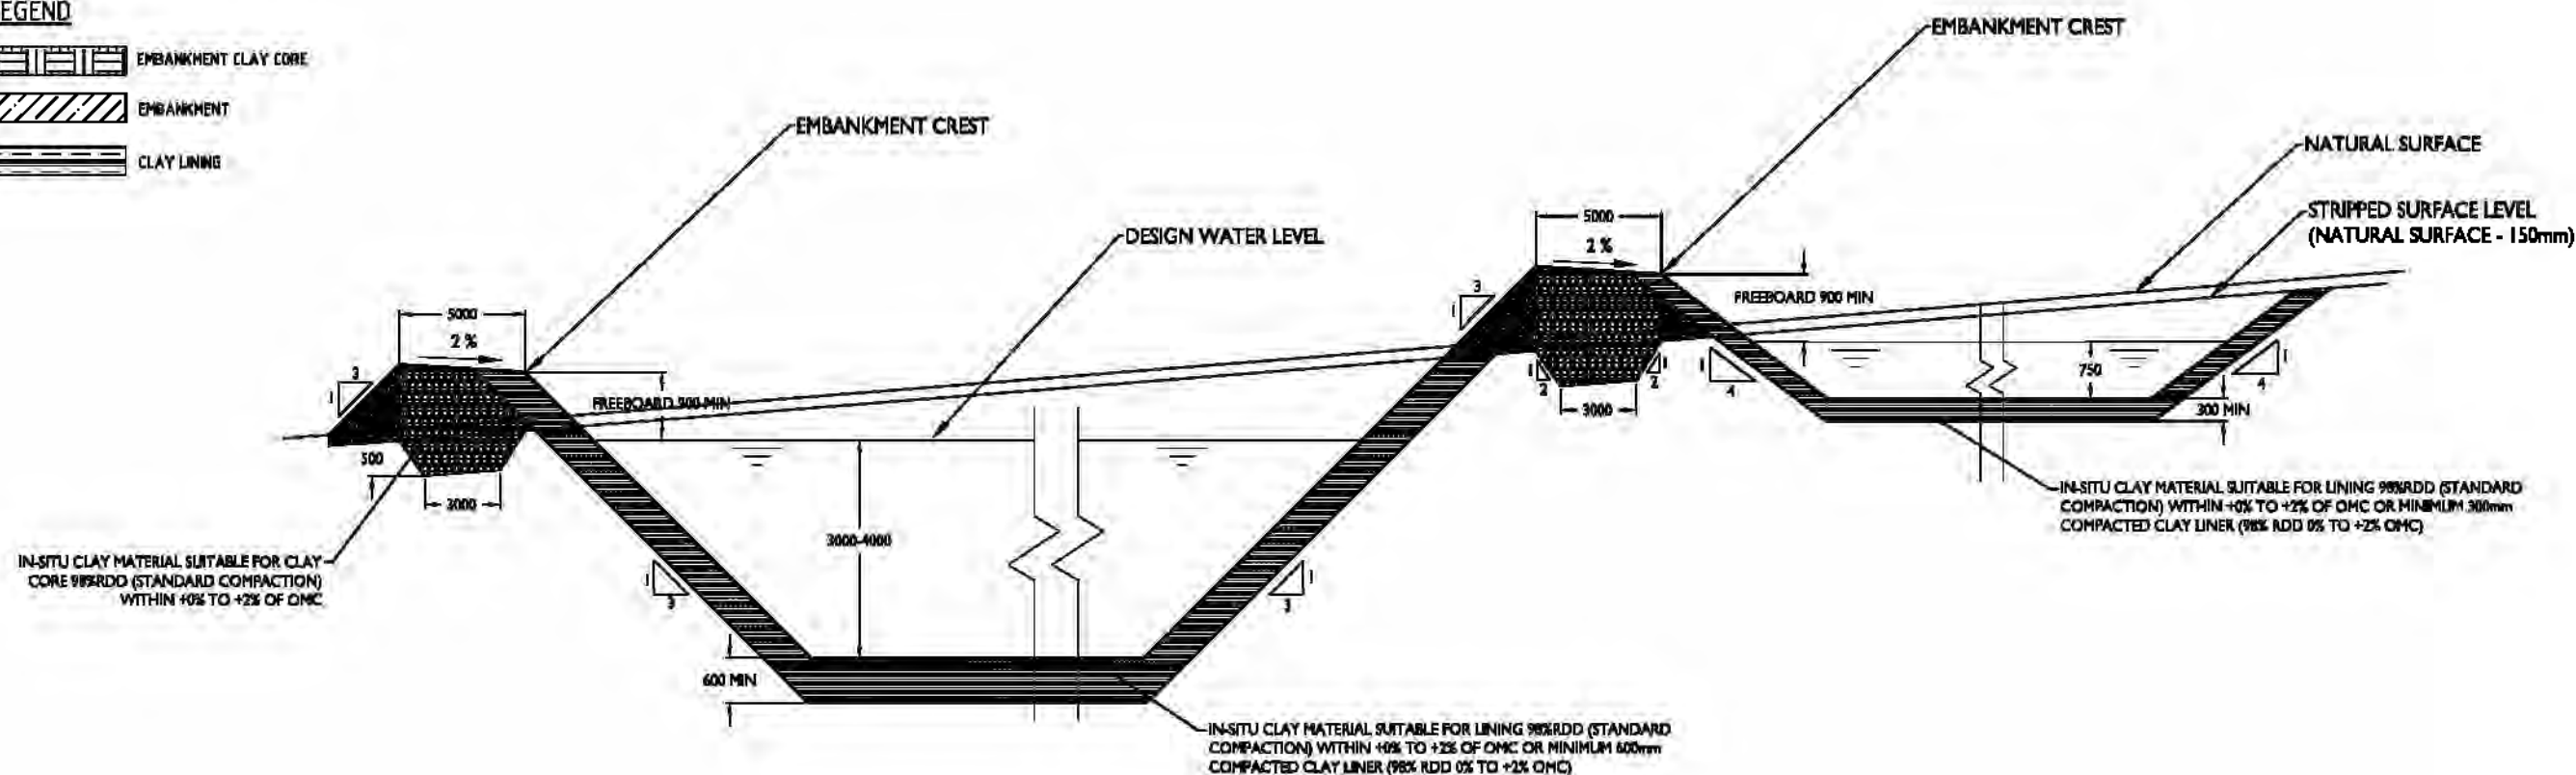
illustrates a typical cross-section through the wastewater lagoon and Figure 7 outlines the specifications for construction of the wastewater lagoons.
